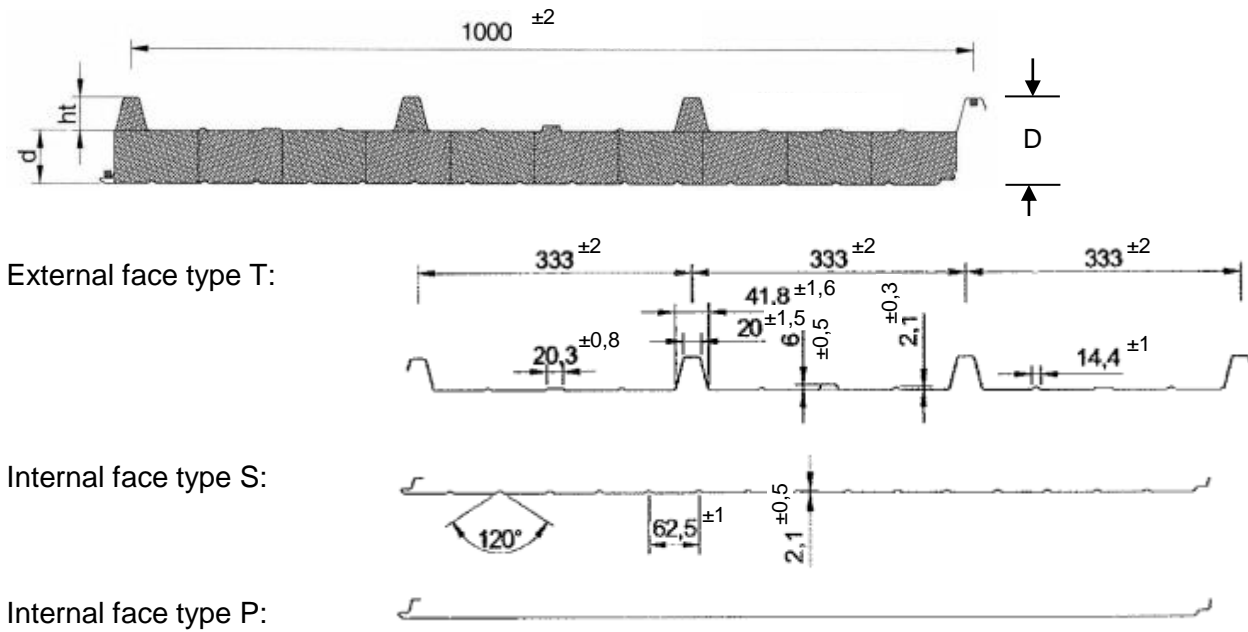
Cross-section of panel type HIPERTEC Roof / SISCOTEK Roof 4G 1000
